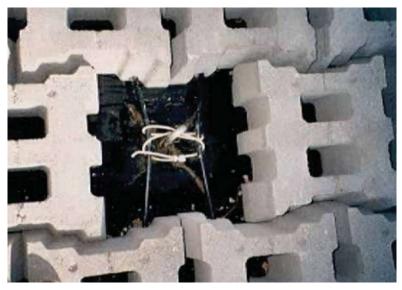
Close up view of a typical tied joint prior to filling with grout (Courtesy of Contech Engineering Solutions, all rights reserved).
